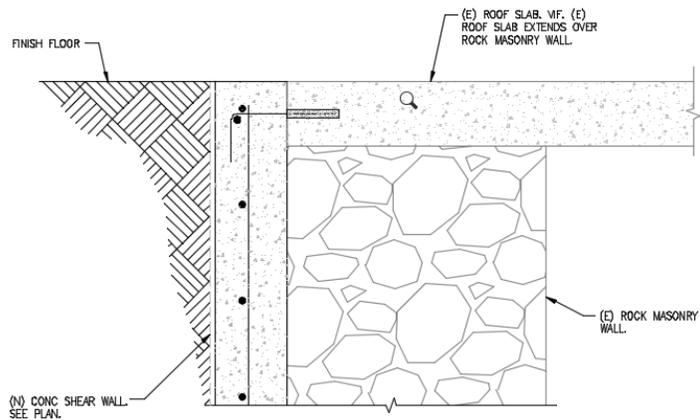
Add connection of concrete beam/shearwall with existing slabs and beams
